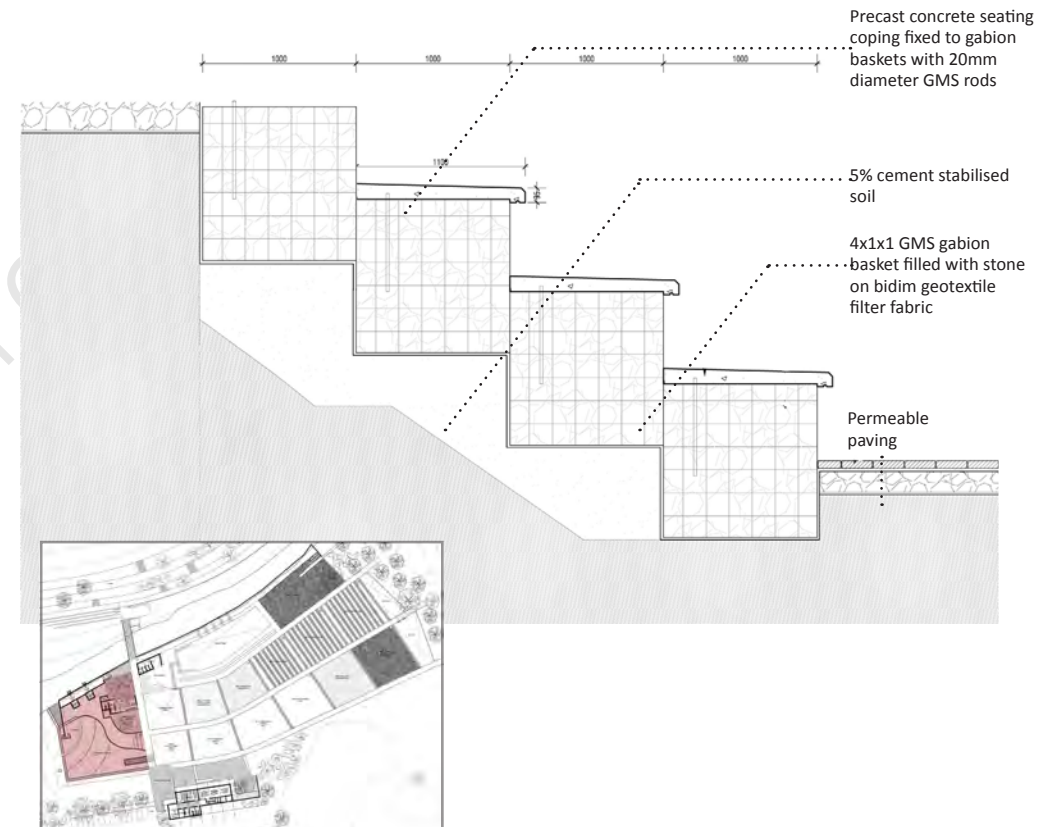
Gabion retaining walls will be used as a green alternative to the concrete wall system. The above detail explores a terraced wall that includes seating, located next to the sedimentation pond. NTS. (Author, 2013)
